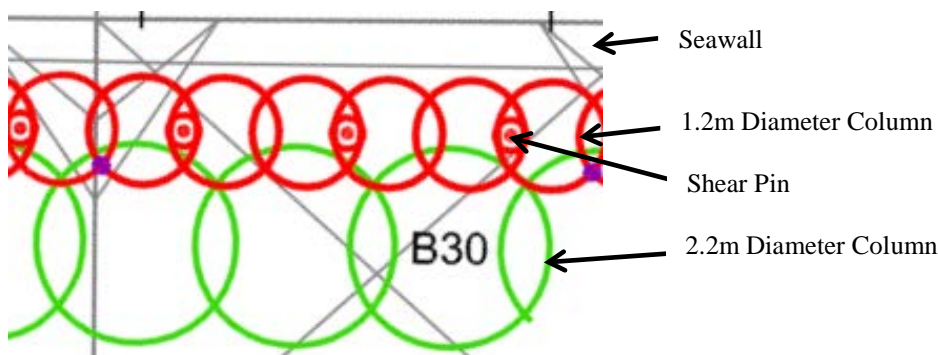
Detail arrangement of Jet Grout columns and shear pins.
